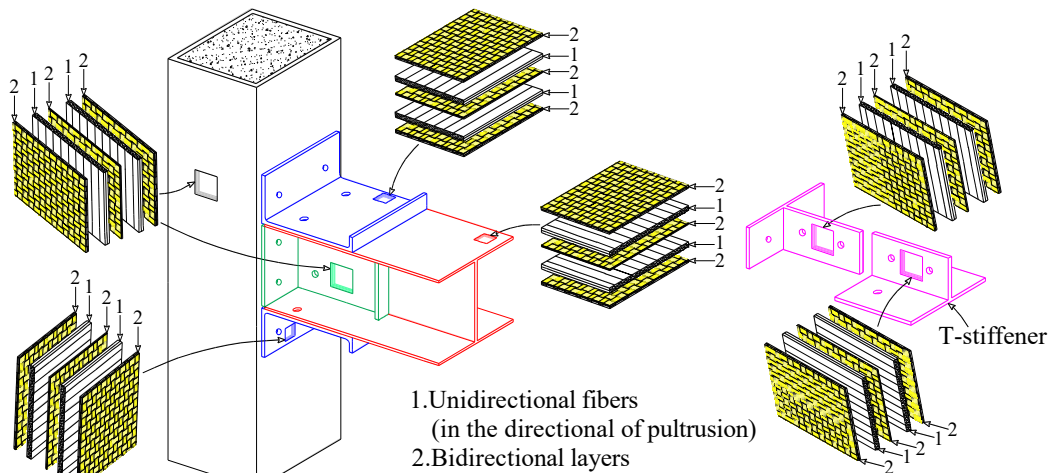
Alignment of connection components fiber orientations in the beam-to-column joint
